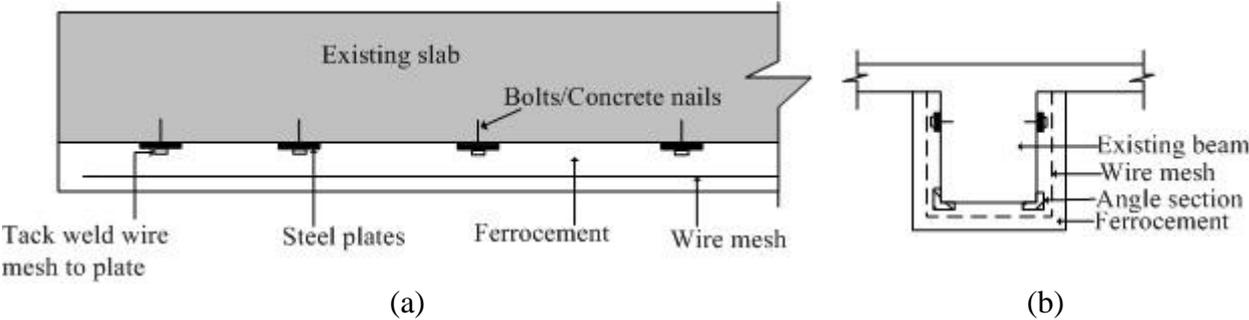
Strengthening of (a) slab (b) beam using steel plates and ferrocement
